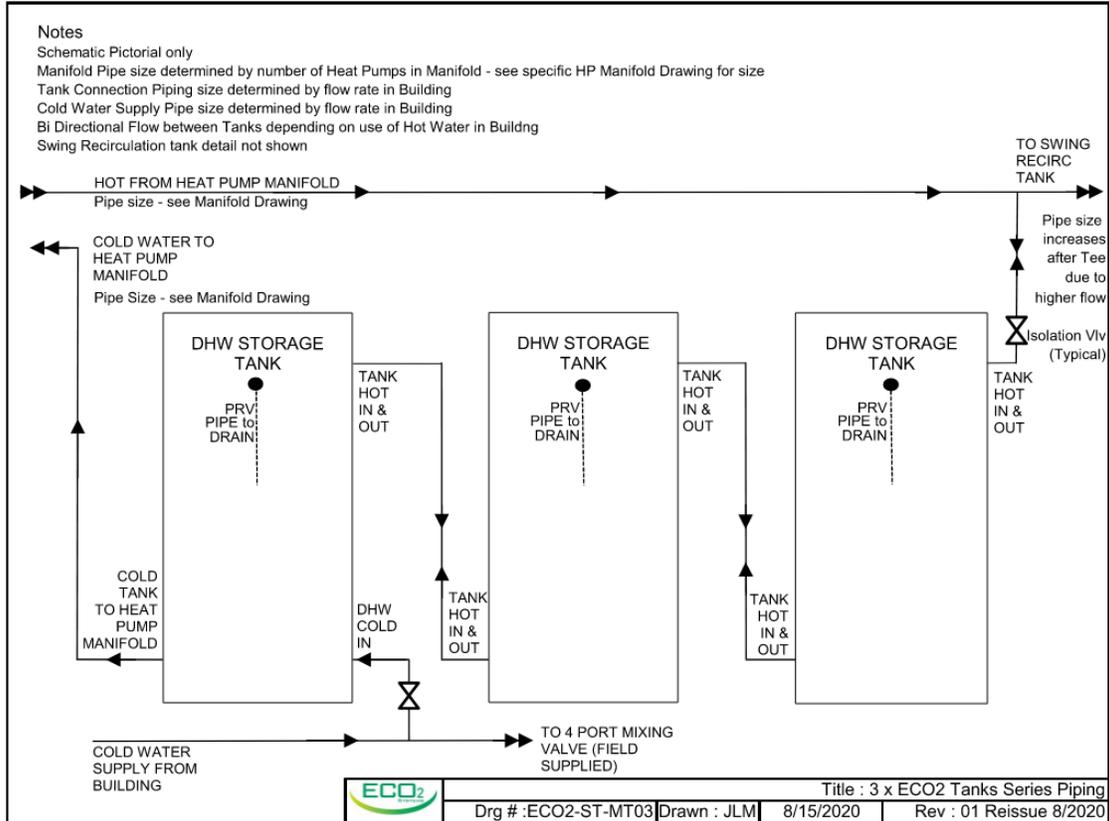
Small Planet Supply Typical Storage Vessel Arrangement
